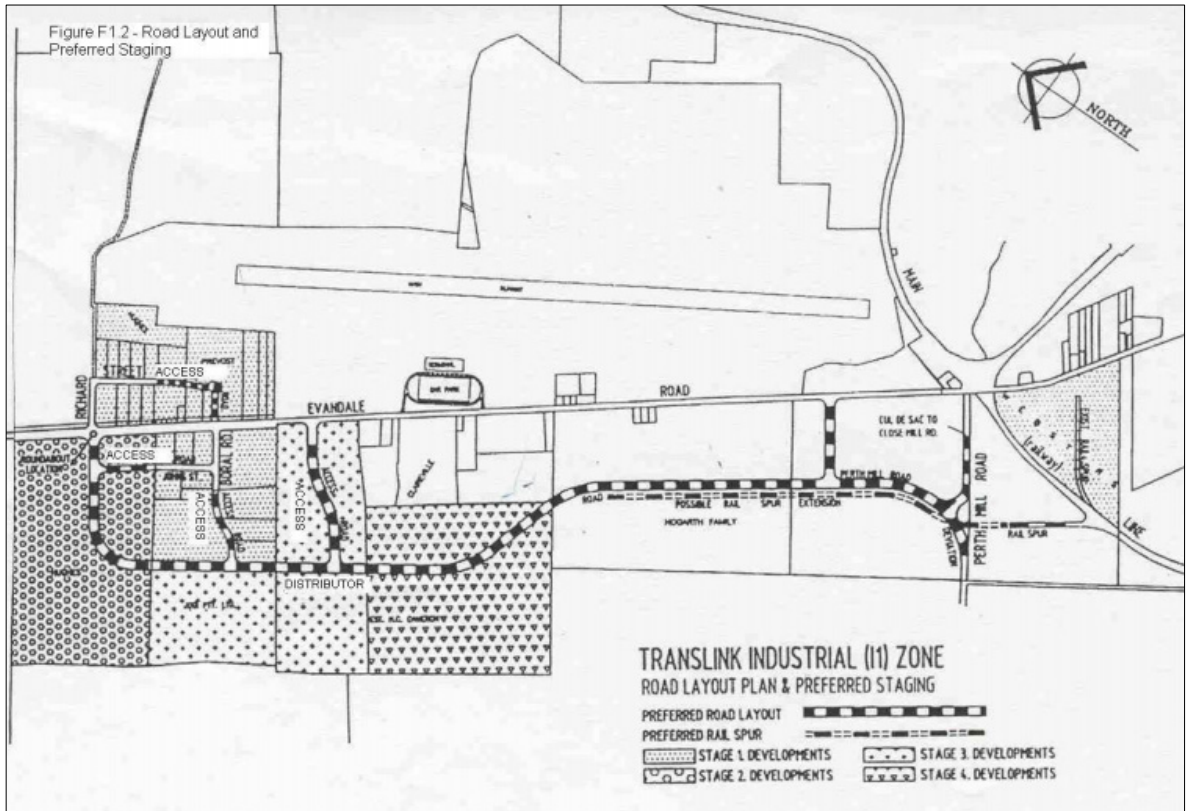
Road layout plan as required by clause NOR-S1.8.1
